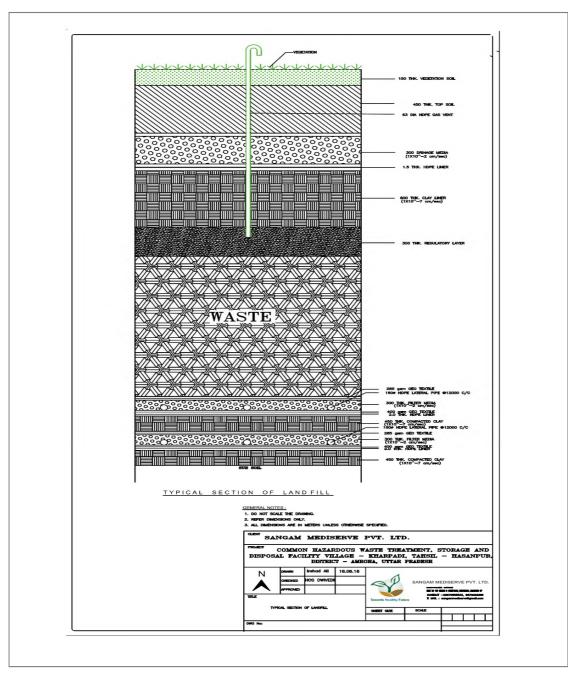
TYPICAL CROSS SECTION PLAN FOR PHASE I OF PROPOSED LANDFILL
